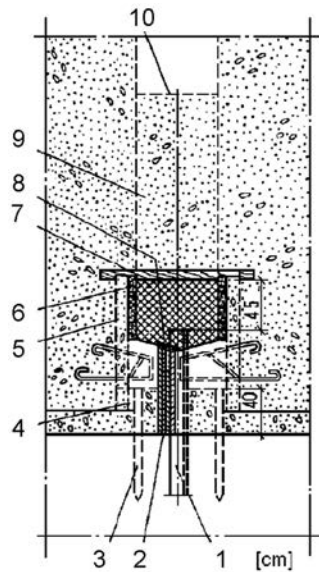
Joint of sheet piling with foundation slab. (1) Sheet piling; (2) filling; (3) wooden piles; (4) planks; (5) supports spaced at 1.0 m; (6) planks; (7) asphalt mastic; (8) oakum; (9) standby openings, left every 4 m; (10) level of asphalt mix in the openings.
